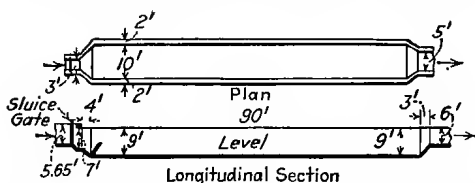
Grit chamber at Irondequoit plant, Rochester sewerage works. (After Skinner.)
